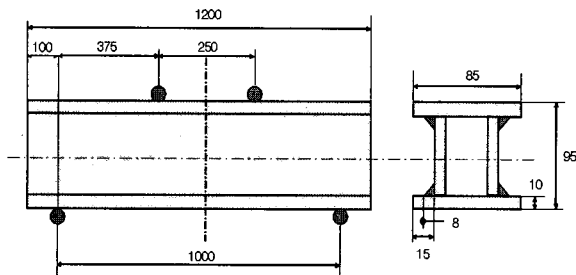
Dimensions and shape of test specimen [unit:(mm)]
